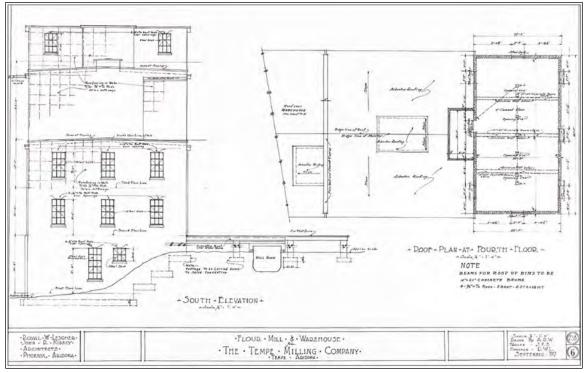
Architectural drawing of Hayen Flour Mill, 1917, south elevation (Architects Lescher & Kibbey)
